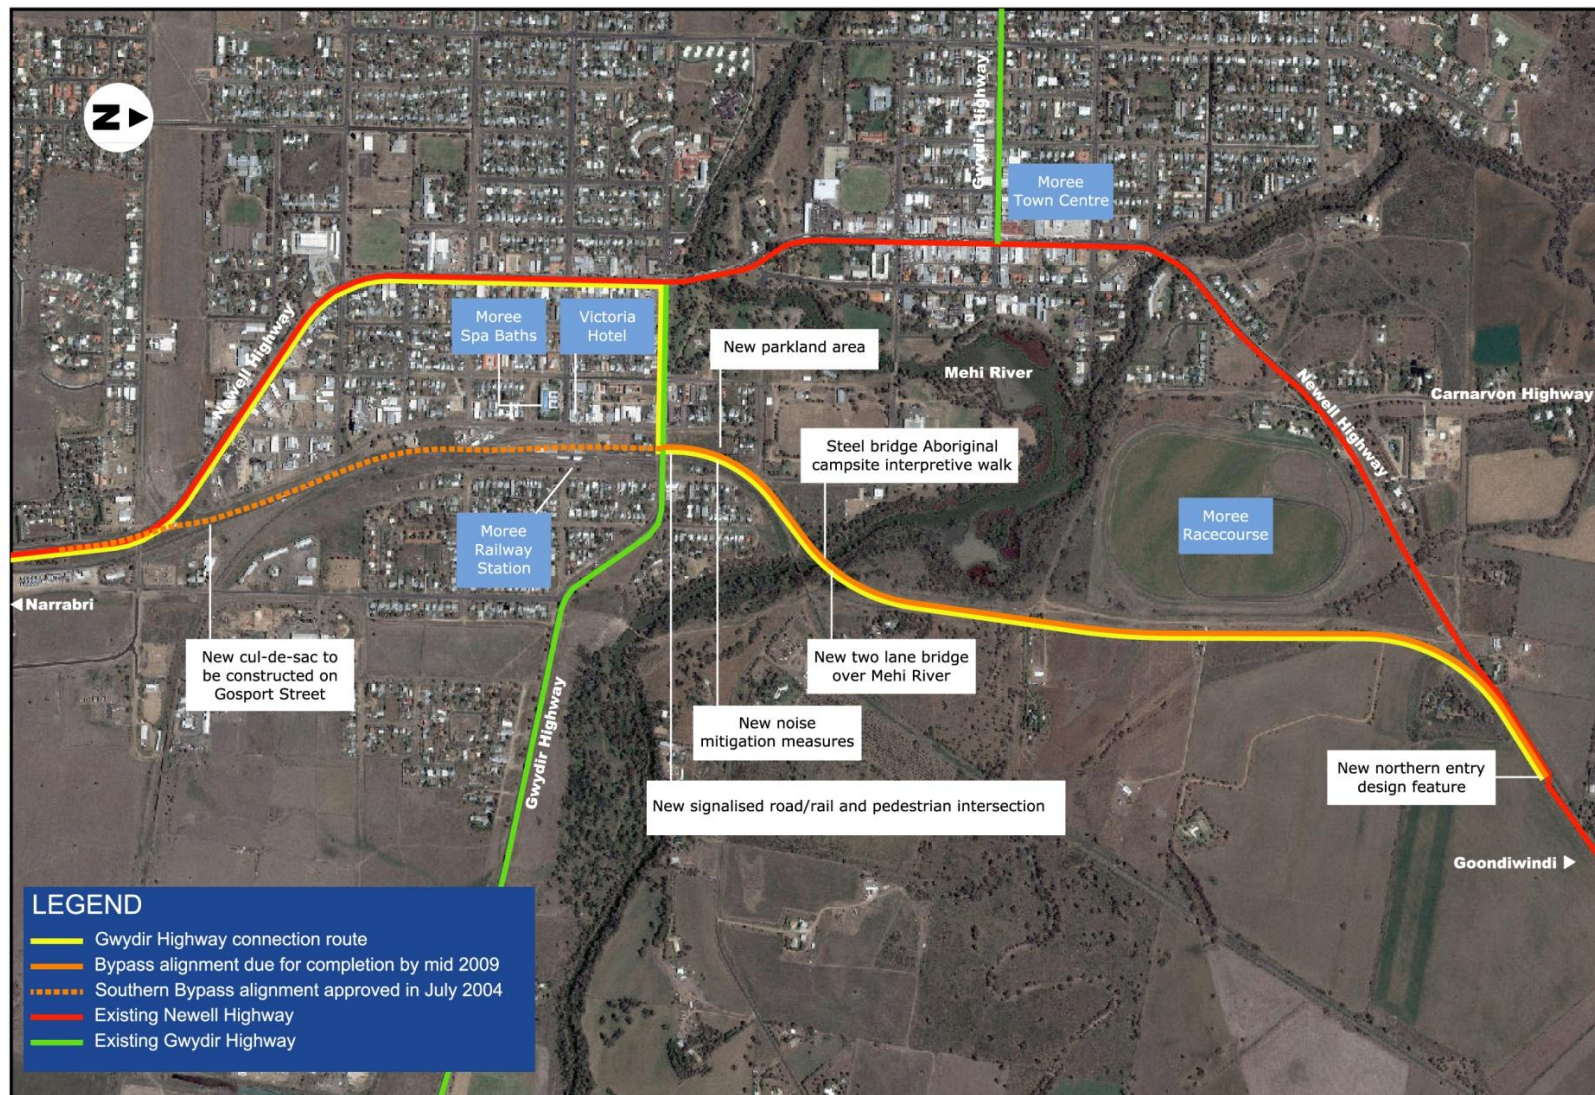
Overview of the approved bypass route and the proposed Gwydir Highway connection route
